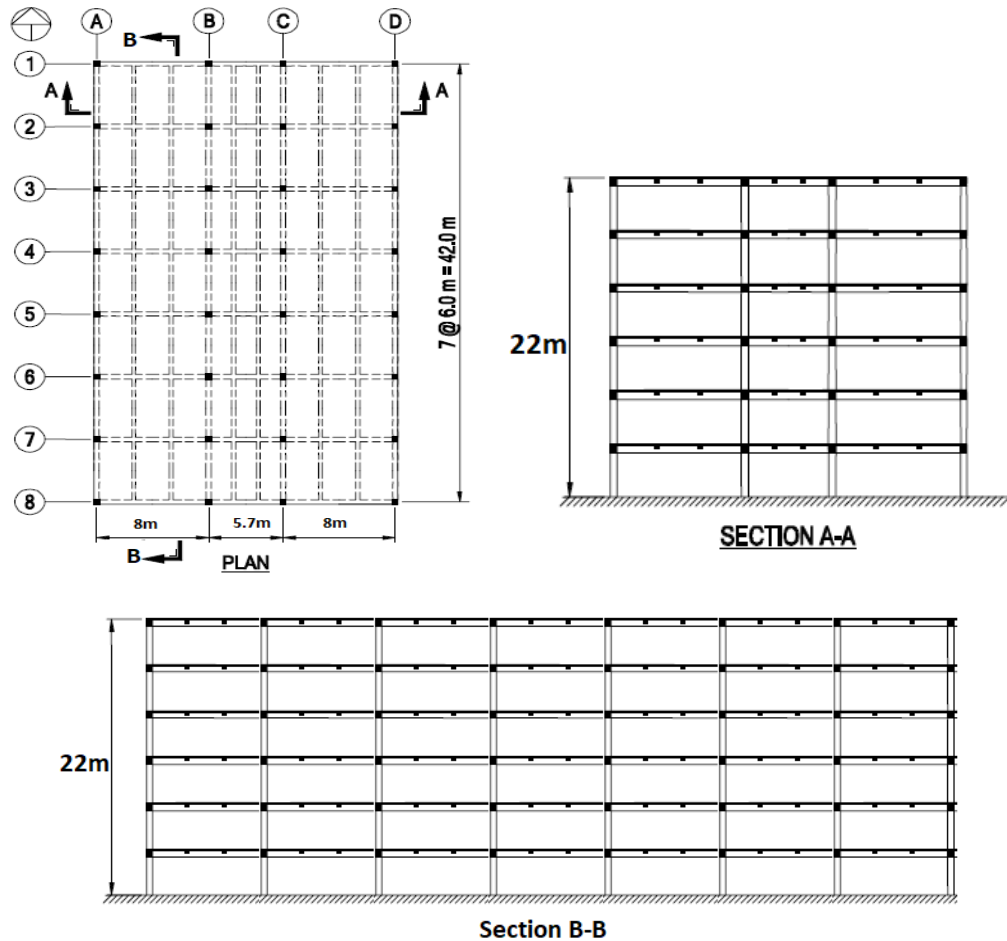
Proposed prototype building plan and elevation views, located in Ottawa
